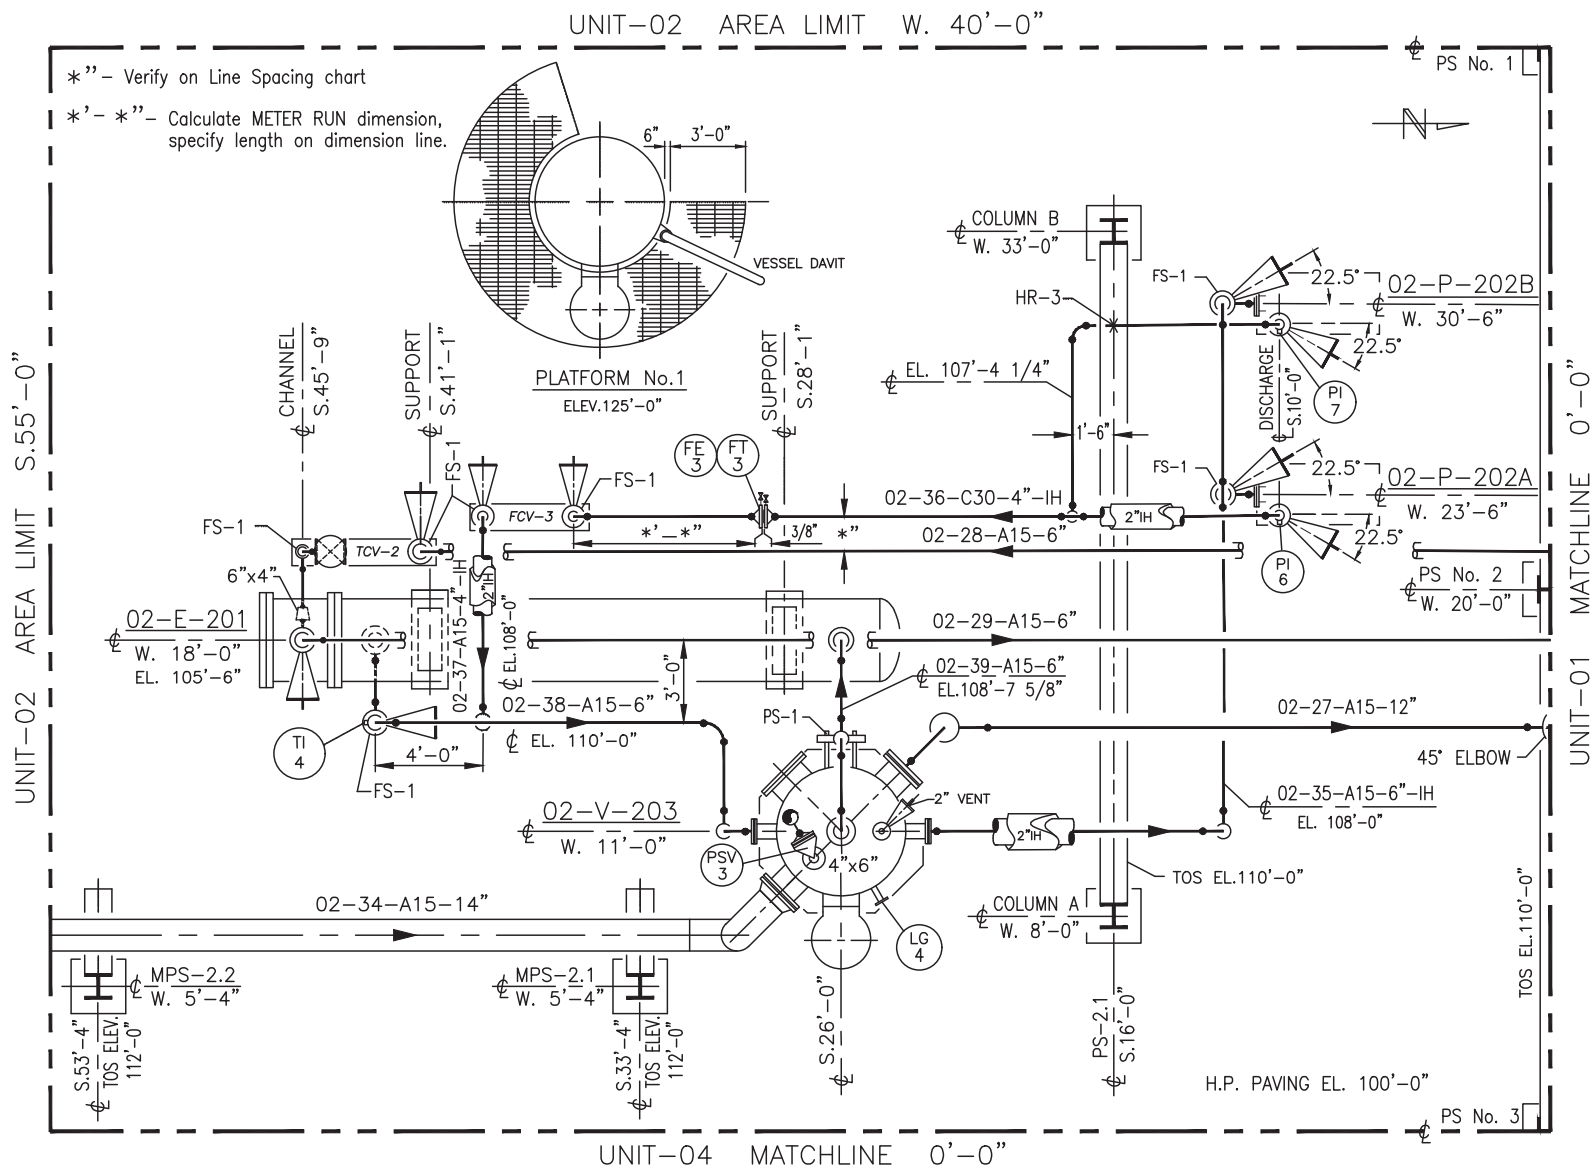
Unit-02: Piping Arrangement Drawing.
